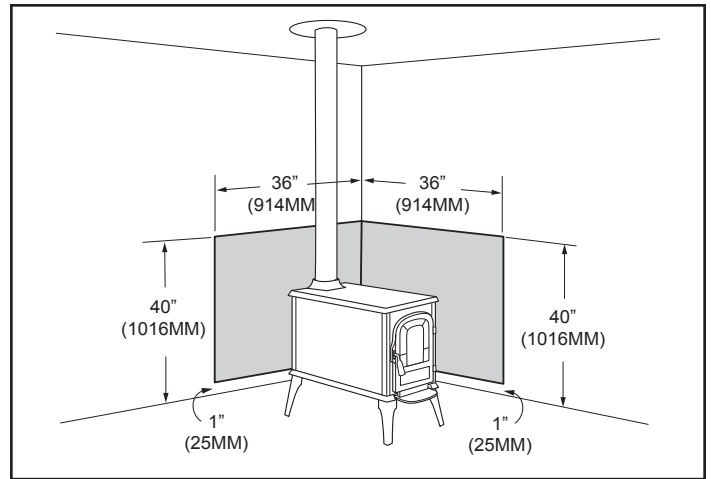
Parallel installation, vertical chimney connector, two wall shields.
